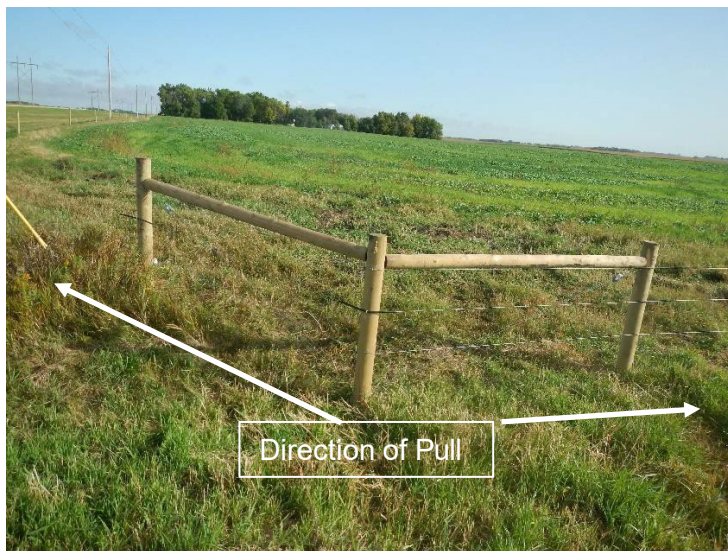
Corner Brace Assembly. Commonly referred to as an H-Brace style corner. The bottom of the brace wires should always be installed on the end/corner post with the top of the brace wire on the tops of the posts heading in the direction of pull. Standard drawing located on page 5: Drawing Number MN-ECS-020.
